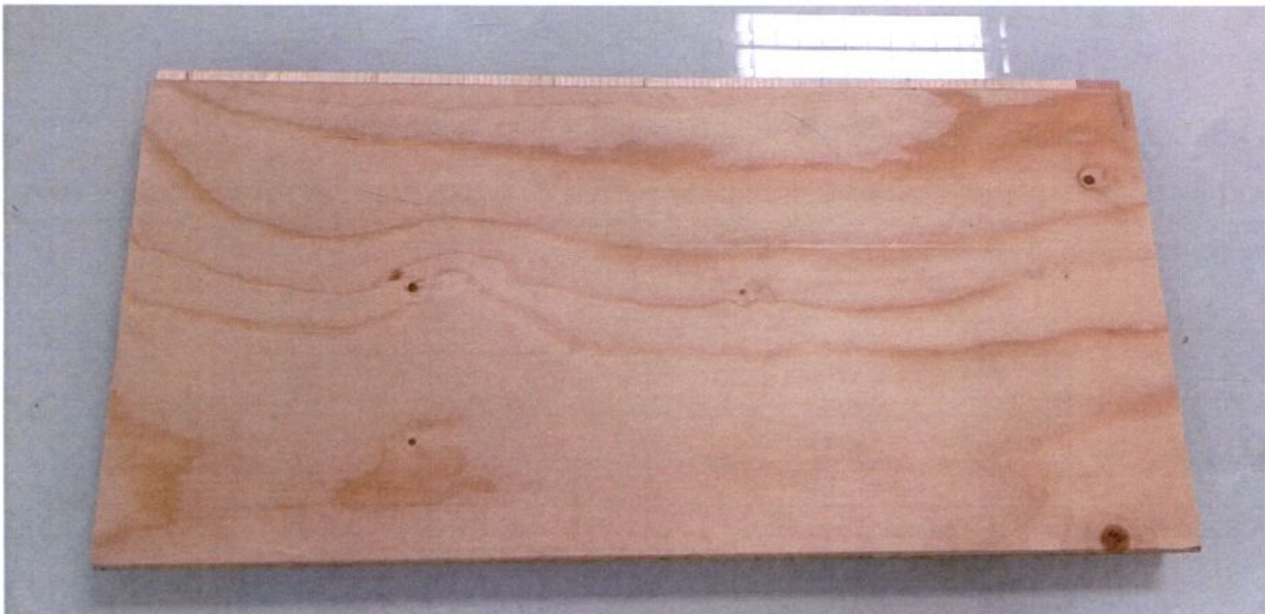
Test specimen of the SPRINGAIR 18/5,2 sport parquet
